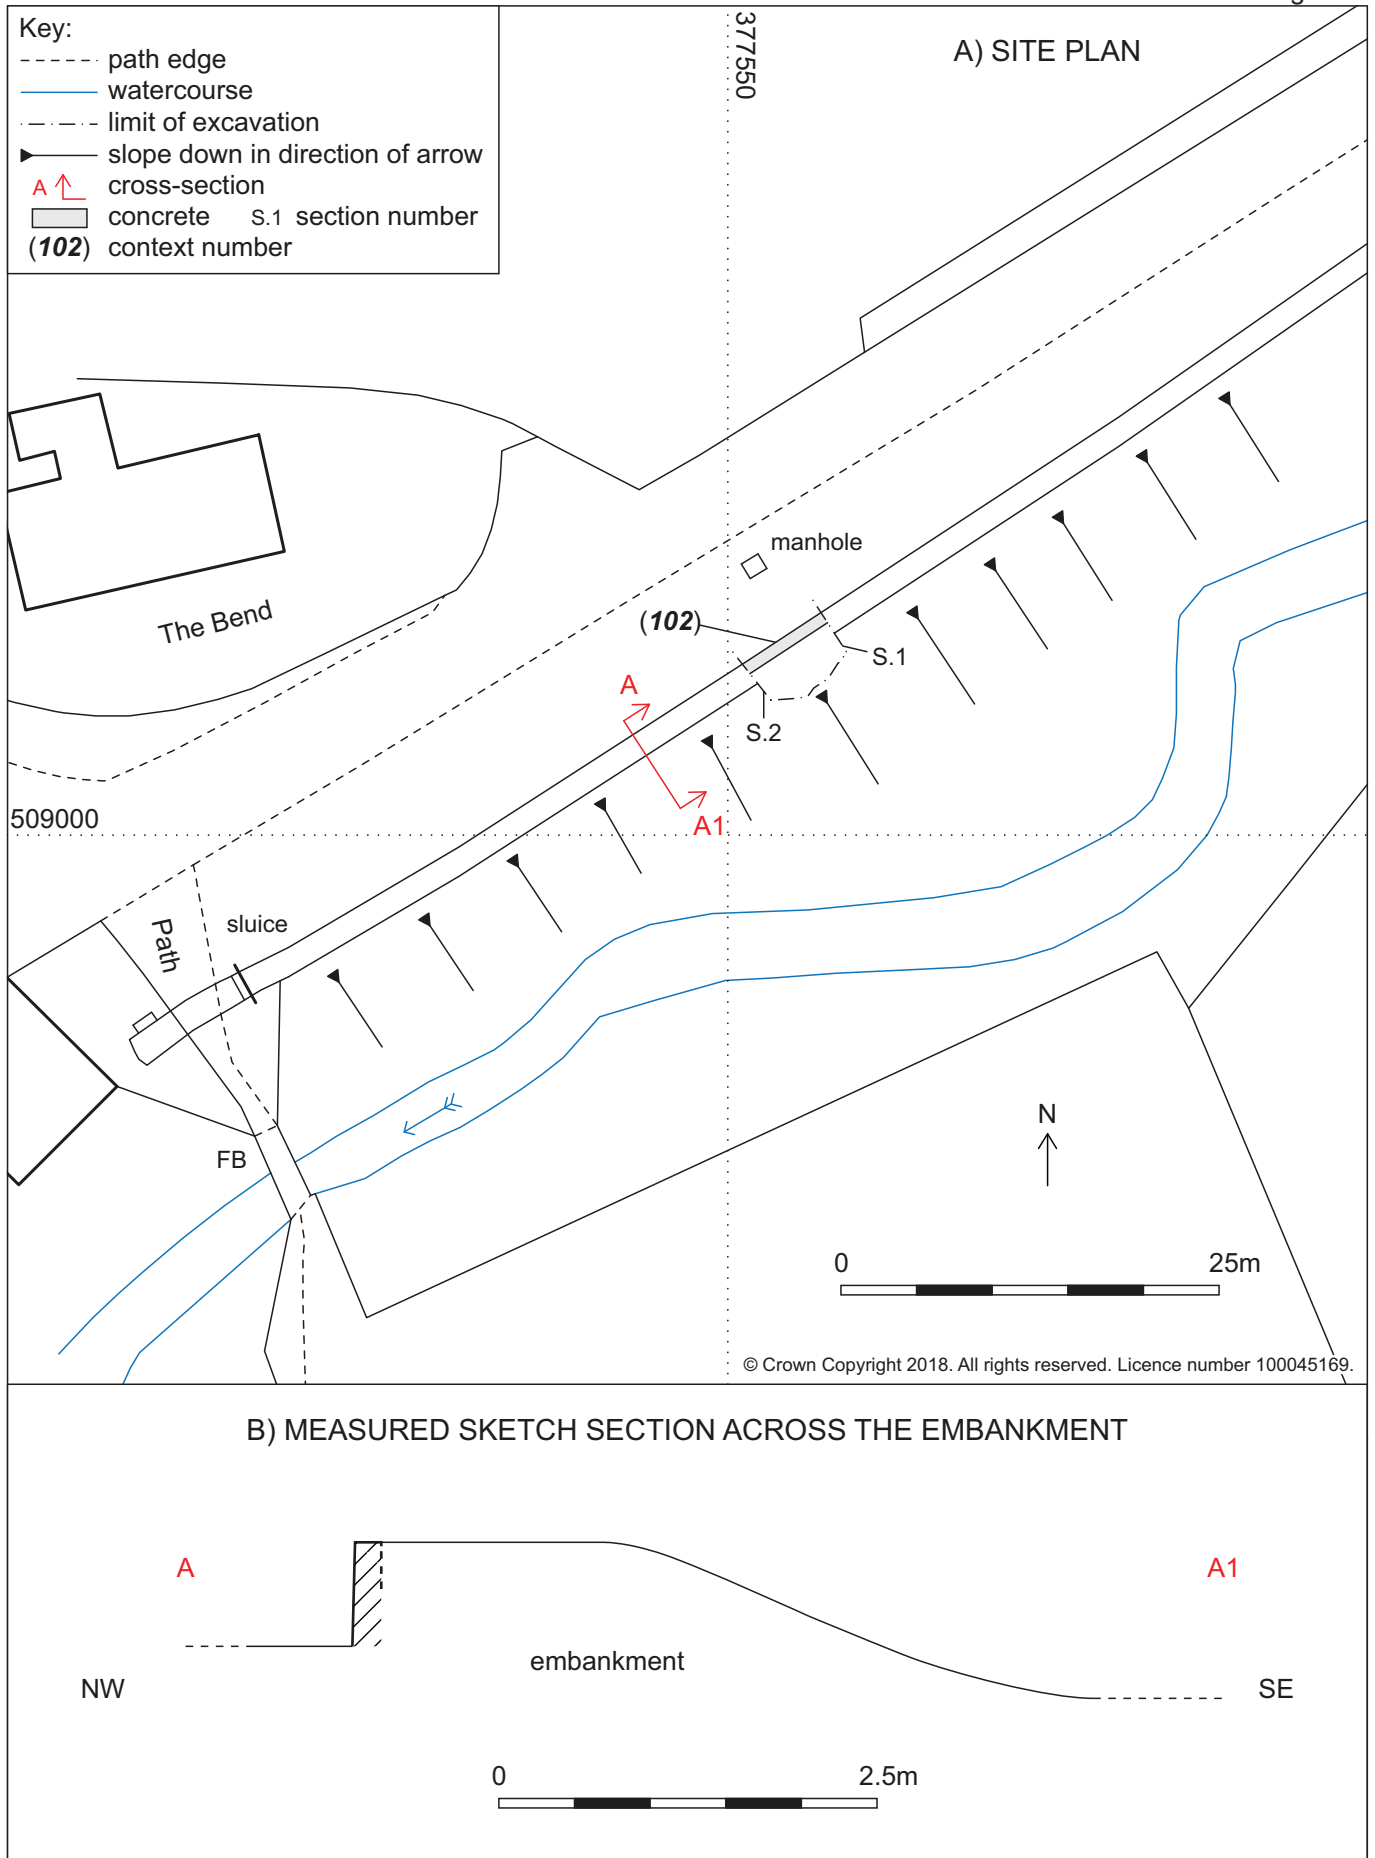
A) Site plan; B) Measured sketch section across the embankment
